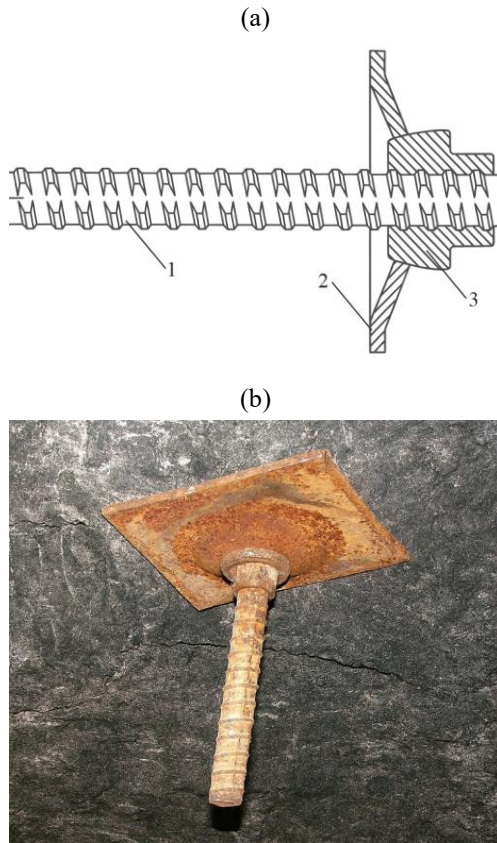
Rope-thread bolt design: (a) schematic illustration; (b) installed bolt in the rock mass; 1 – bolt; 2 – bearing plate; 3 – tightening nut
